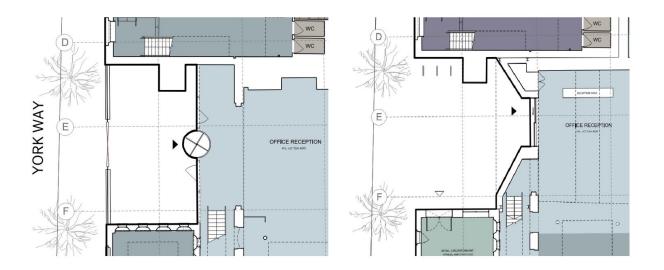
Existing and proposed plans - Entrance to Jahn Court adjoining 34b York Way
